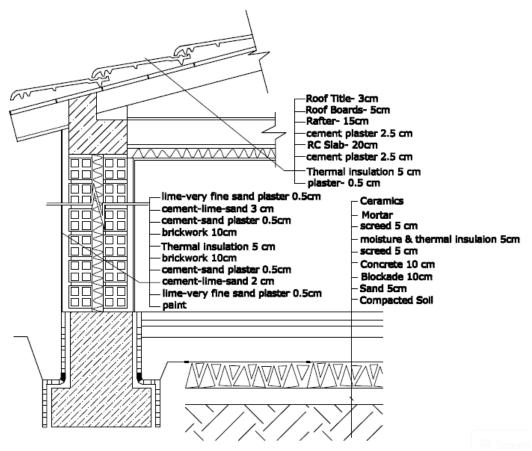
Construction Technique in Contemporary period- Brick wall $-C_{12}$
